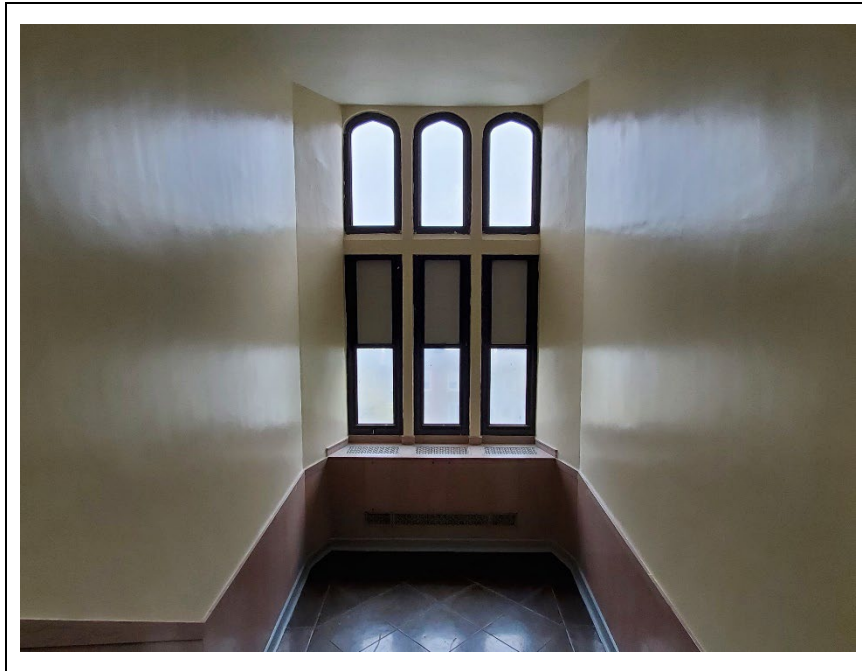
2<sup>nd</sup> floor Center Hallway from Boy's to Girl's Restrooms
